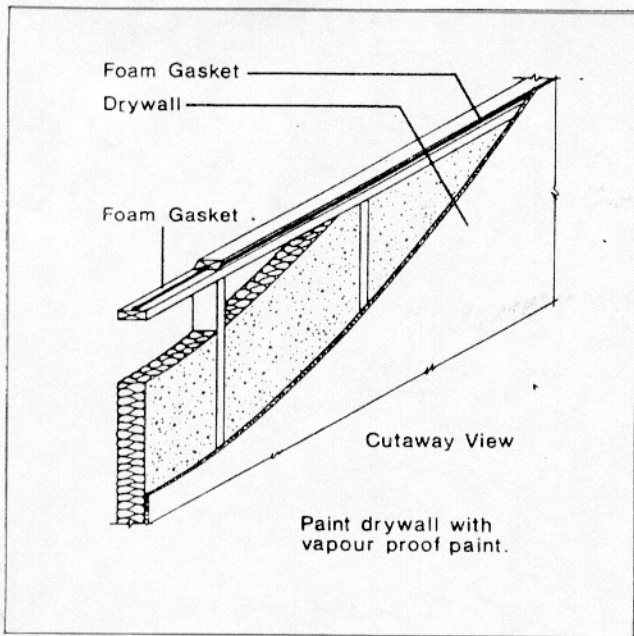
Drywall/Gasket/Vapour Proof Paint Air Vapour Barrier
